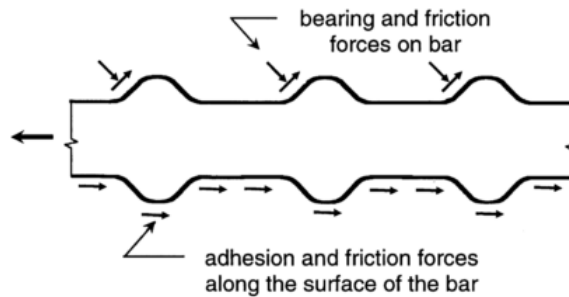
Load transfer between deformed steel and concrete (ACI Committee 408, 2003).
